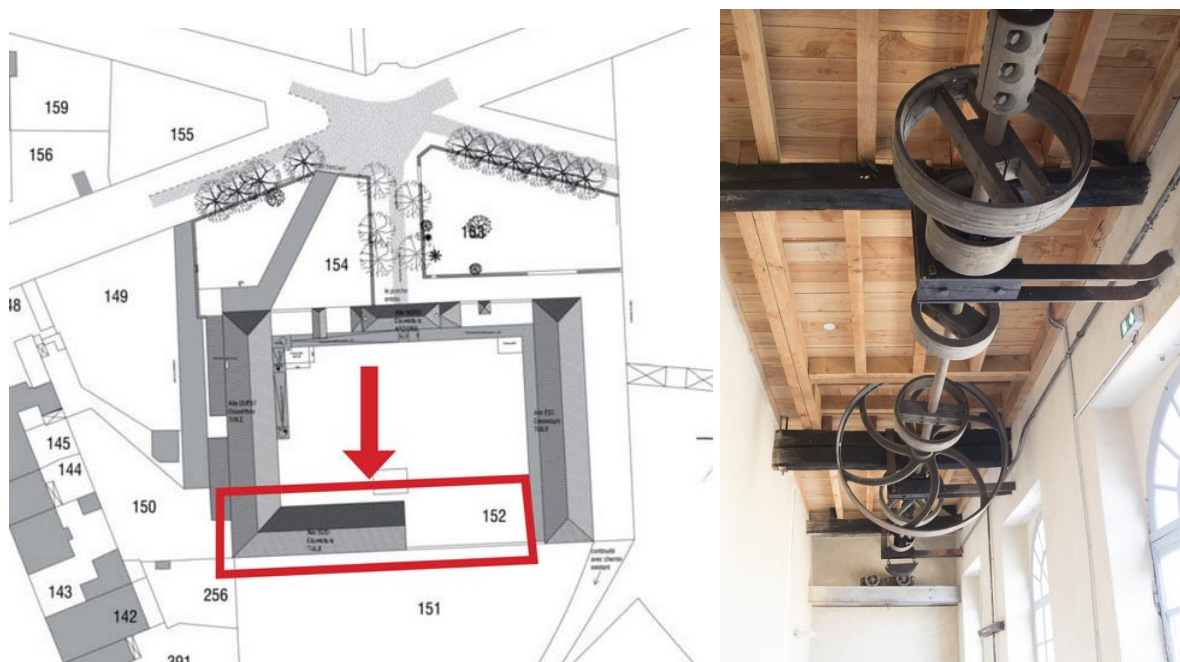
Site plan for the reconstruction of a complex of workshops for the repair of mine equipment [2] and a fragment of the workshop interior
